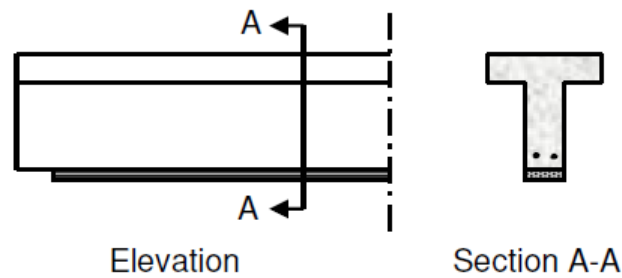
Typical Flexural Strengthening of a Reinforced Concrete T-beam Using Externally Bonded FRP Reinforcement, [CSC.TR-No55, 2000].
